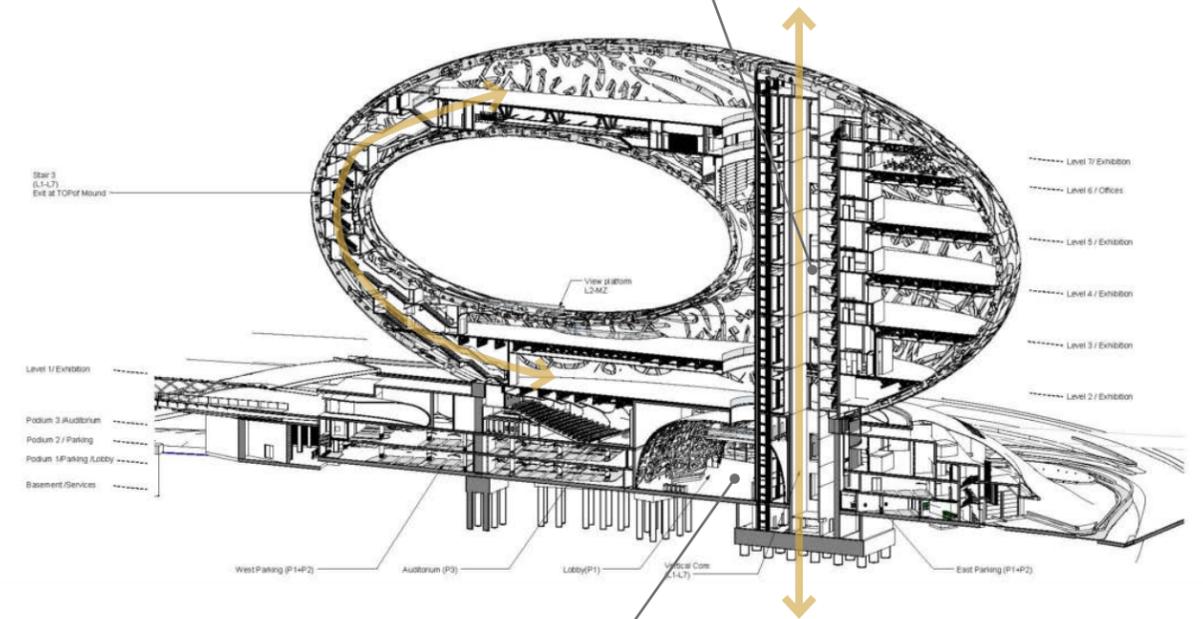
| FLOOR PLAN SKETCHES (Killa Design, 2021)
